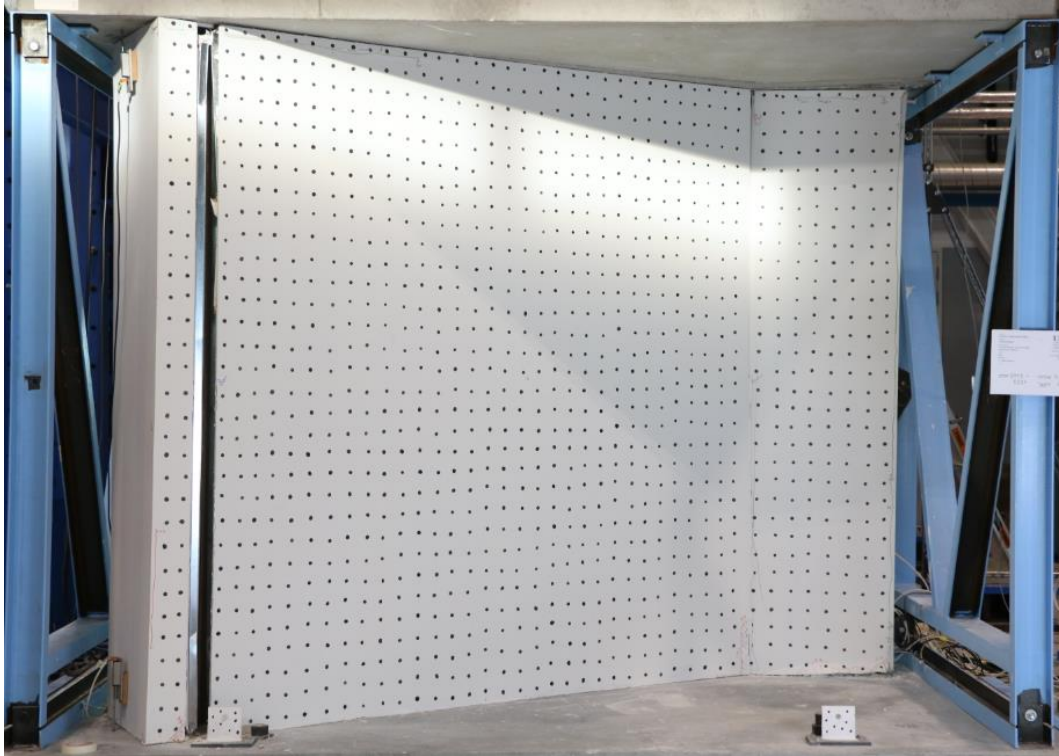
Specimen B1 – Step 16 – photograph after completion of test
